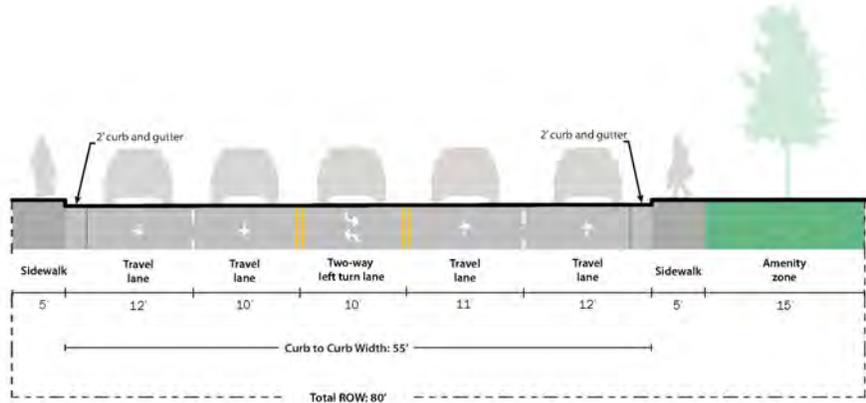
Section K (72nd Avenue West of Zuni Street – Looking East)
